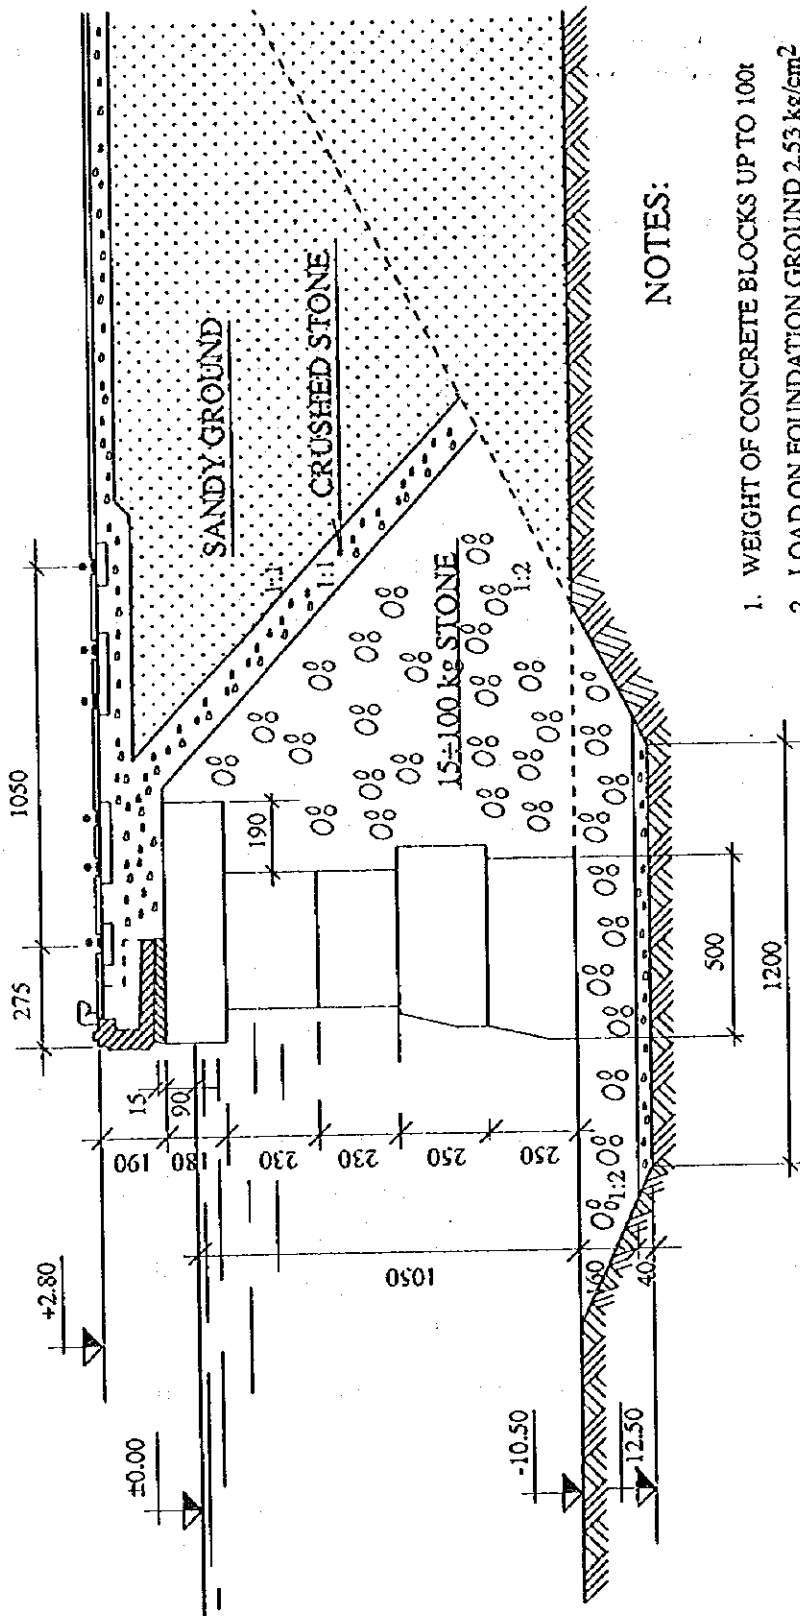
Typical Cross Section of Quay - Latakia Port
